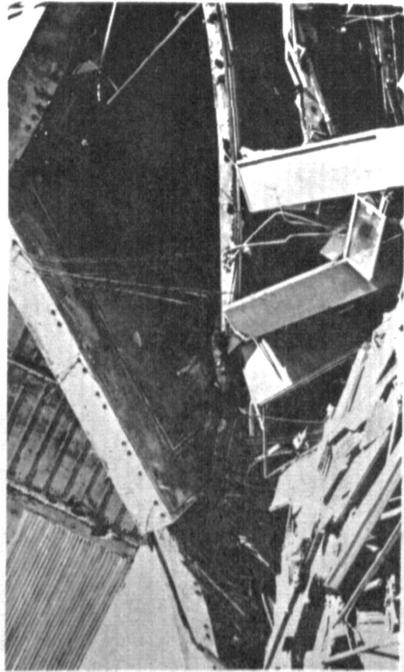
Stacked floor slabs at Four Seasons Apartment Building. Note failed prestressing rods.
